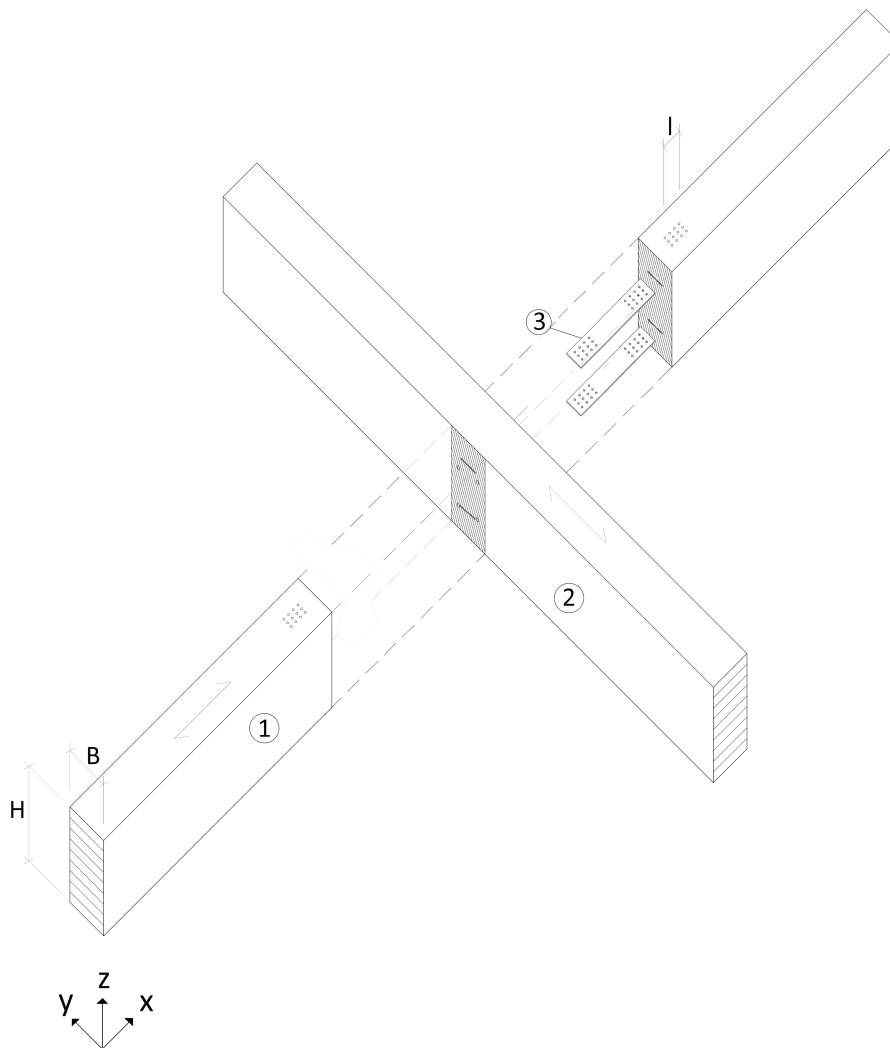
Reinforced basic-type joint - alternative layout. Diagram showing the assembly and components of the joint
